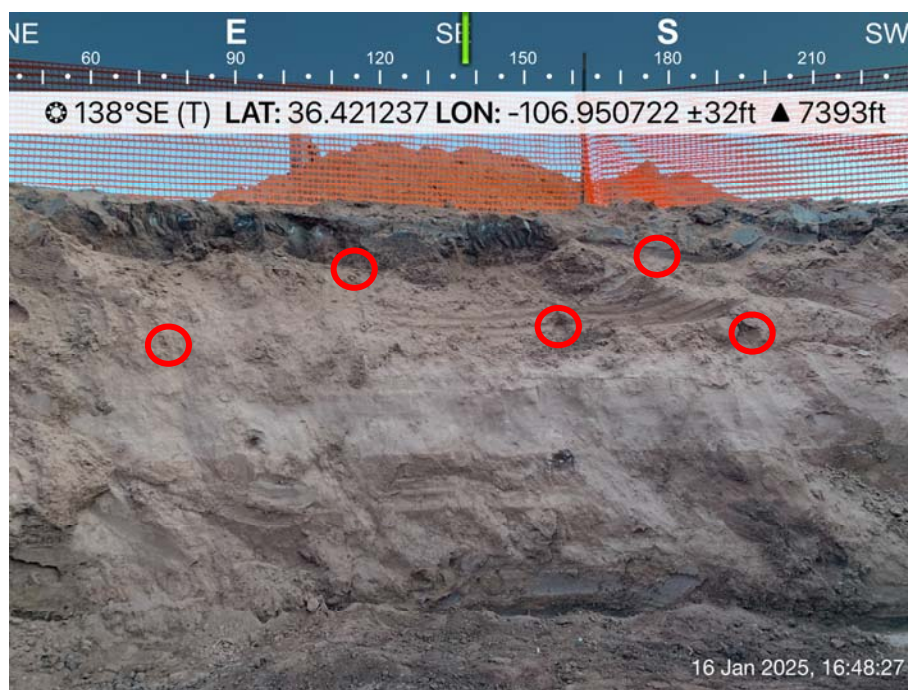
SS05 collected as a five-point composite sample 0-4 ft bgs from southeast sidewall of excavation.
